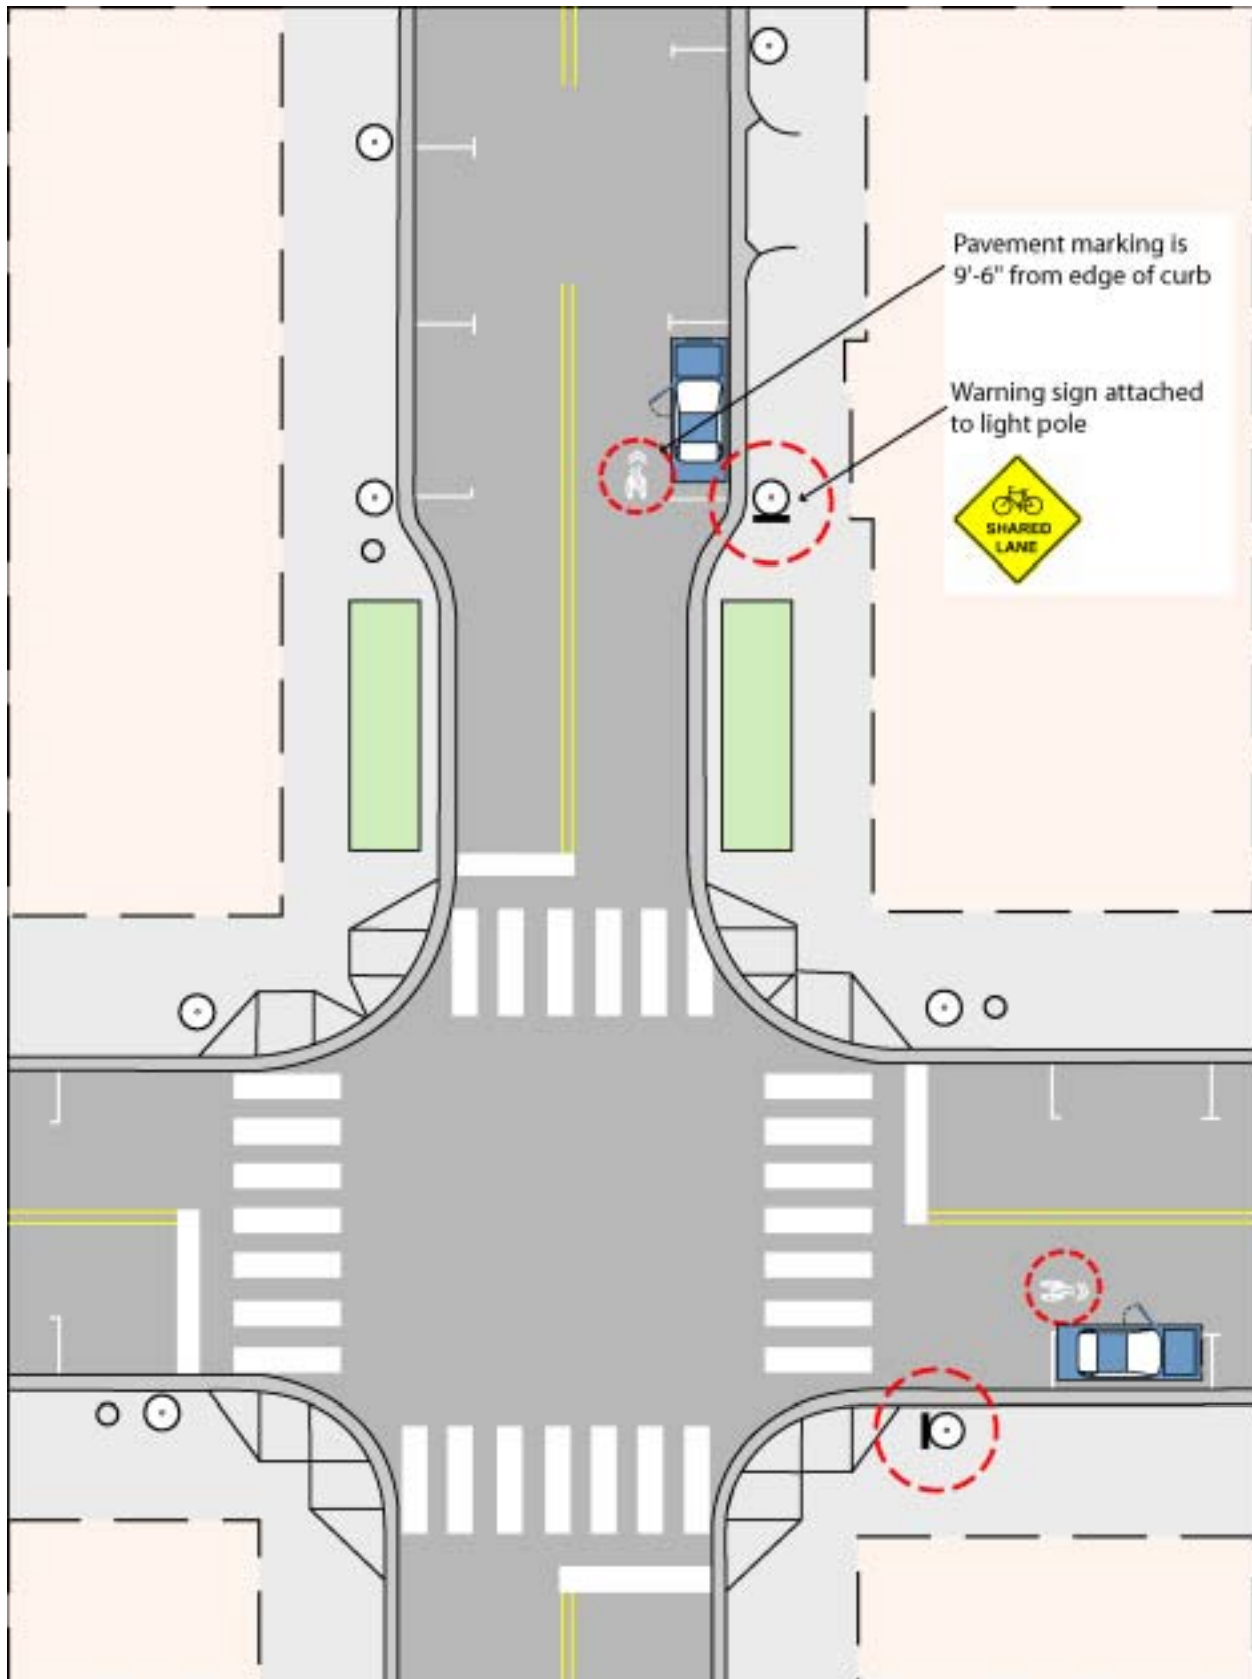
Proposed Detail Sign and Pavement Marking Placement
